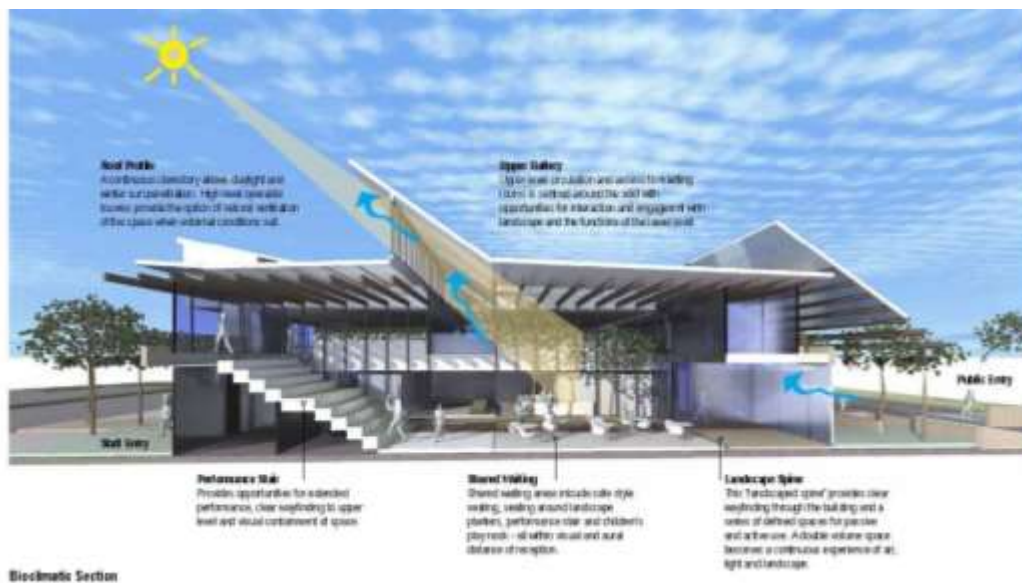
Section showing elements of light, ventilation and vegetation in the building. (source: ArchDaily, 2015)
